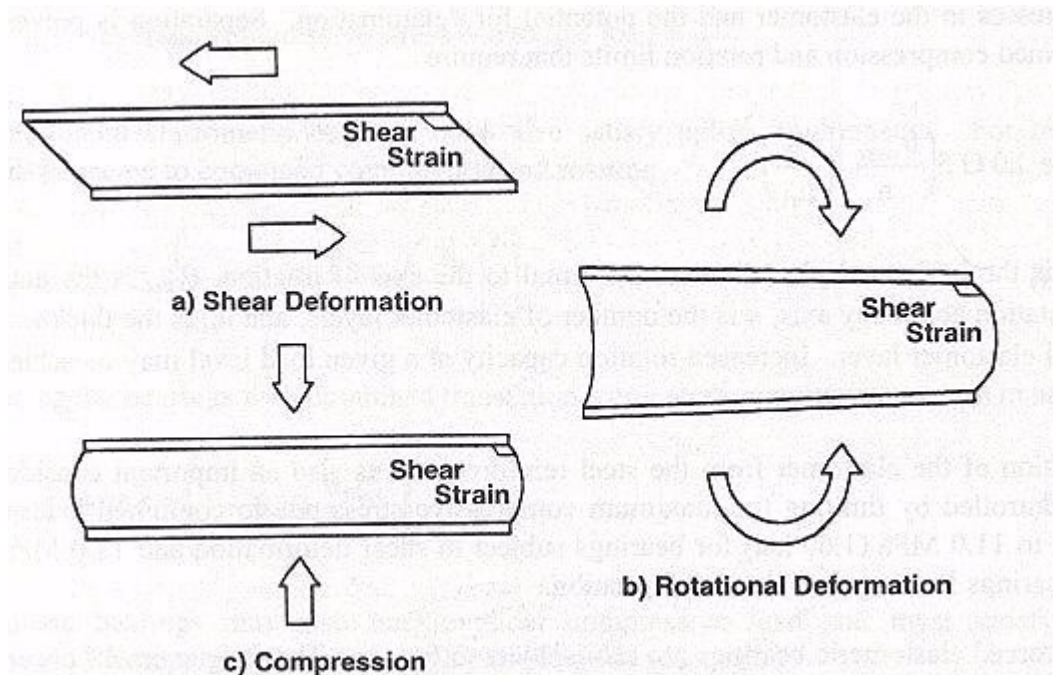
Cross-Section of Elastomeric Bearing. (No moving parts to 'freeze-up')
